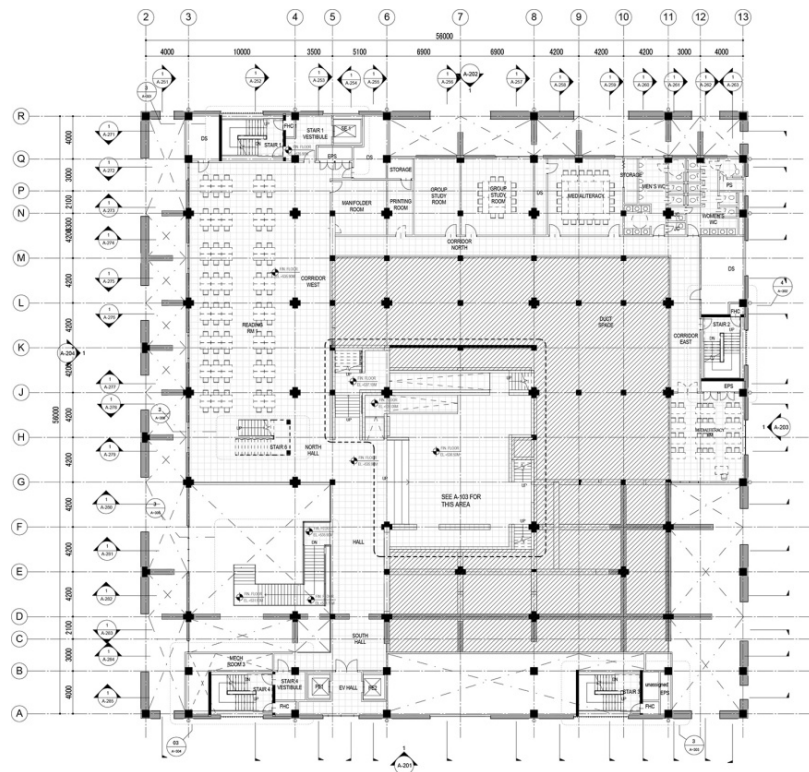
KNC 1<sup>st</sup> Floor Plan
